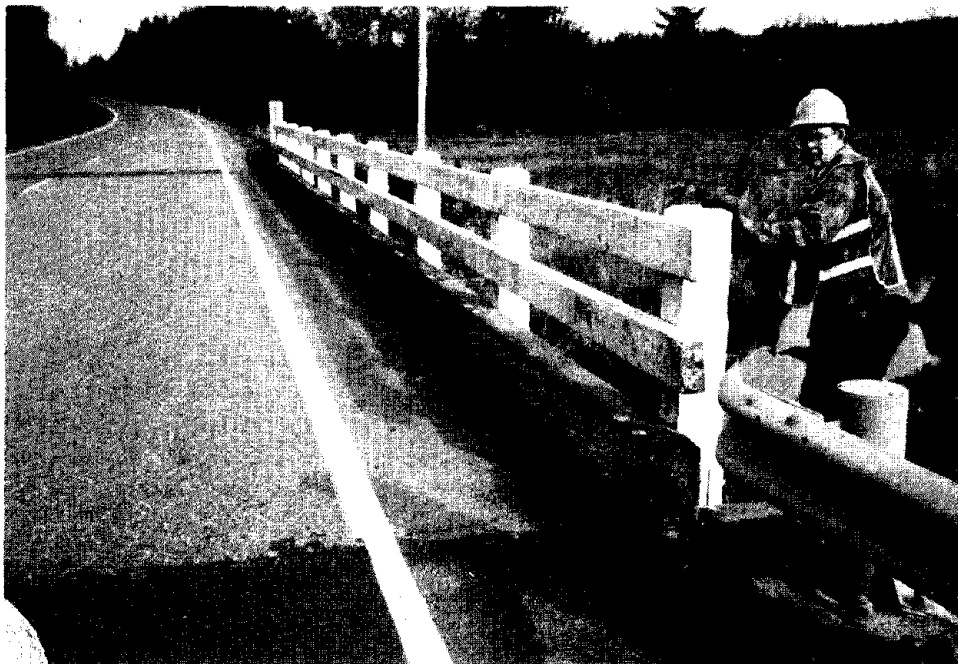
Jorgenson Slough Bridge prior to Service Level 1 (SL1) retrofit.
